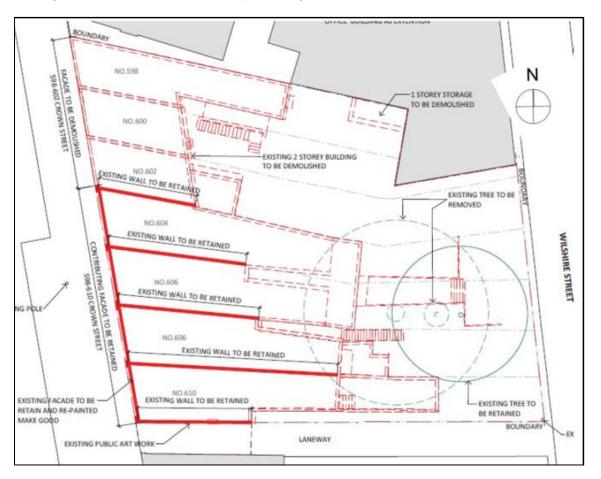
Indicative Pre-DA demolition plan showing walls to be retained in solid red
